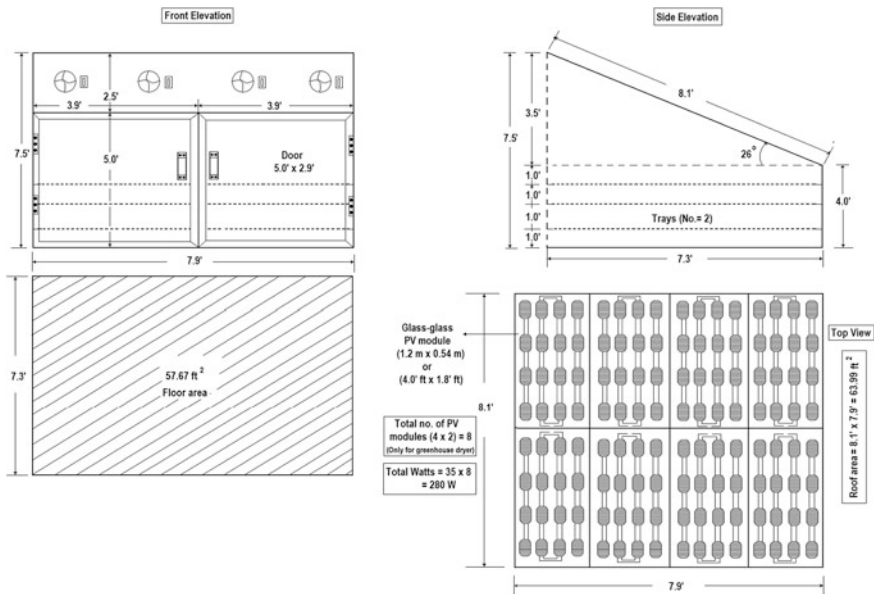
Schematic view of a PVT greenhouse dryer
